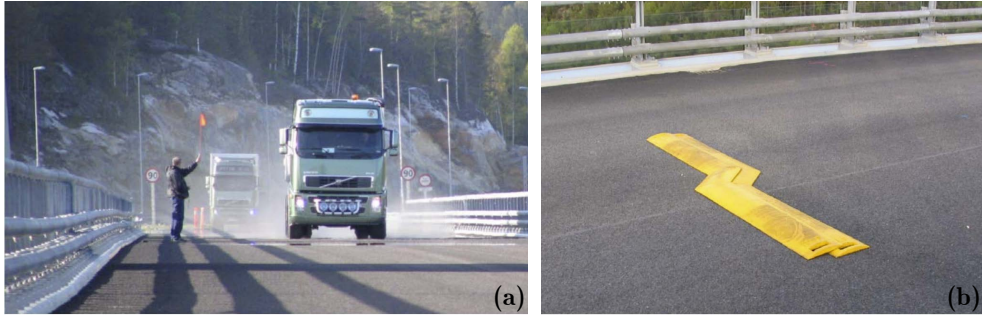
Dynamic test performed on the New Svinesund Bridge [44]: (a) Passage of a truck on a road bump fixed on the deck; (b) close-up of the rubber road bump.
